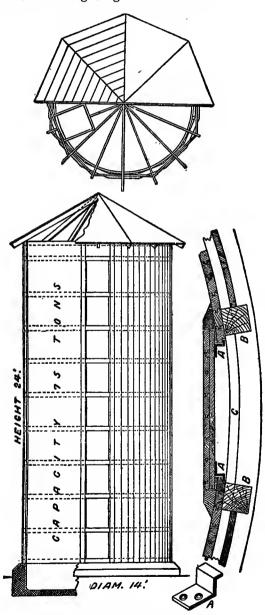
DETAILS OF ROOF CONSTRUCTION
